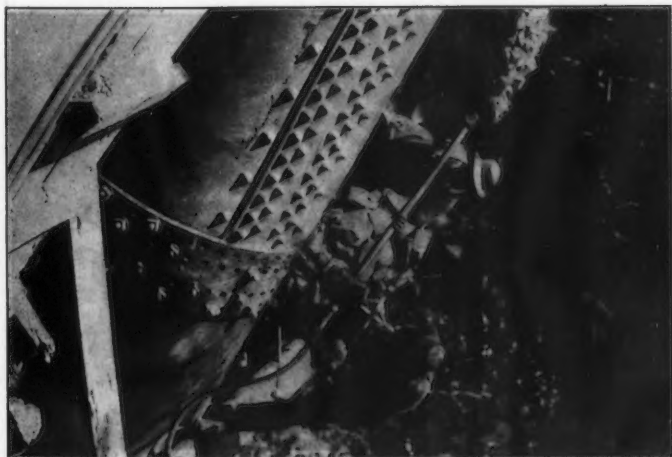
DETAIL OF PENNSOCK, DURING CONSTRUCTION.
